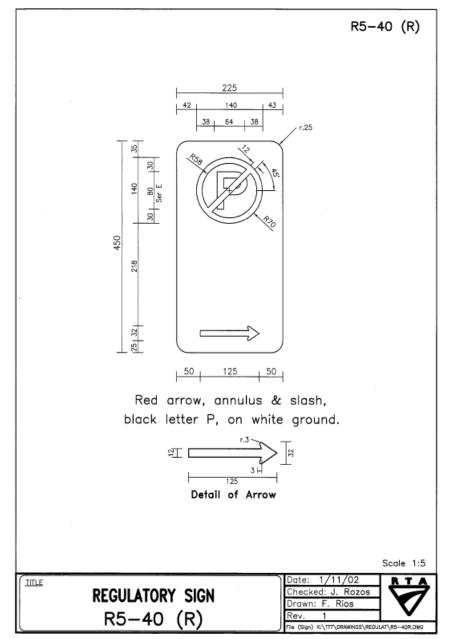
Signage to be installed approx. 15 meters from corner on Harris Street
